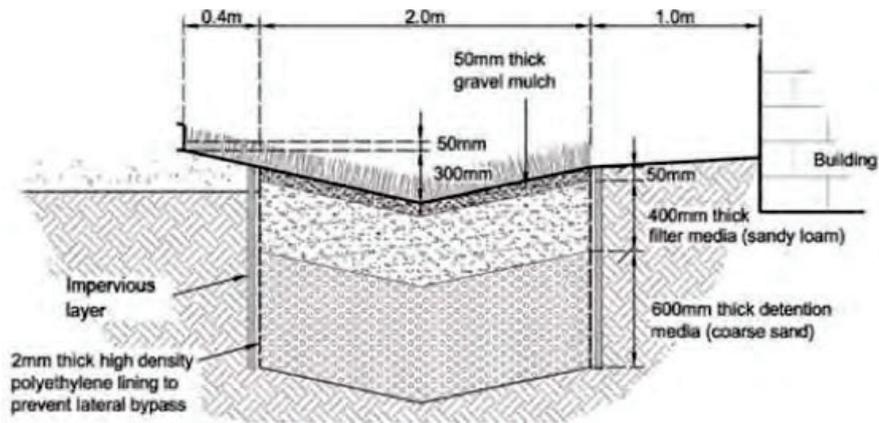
Example of a rain garden design (from DoW, 2008). Note that the rain gardens will not be located adjacent to buildings.
